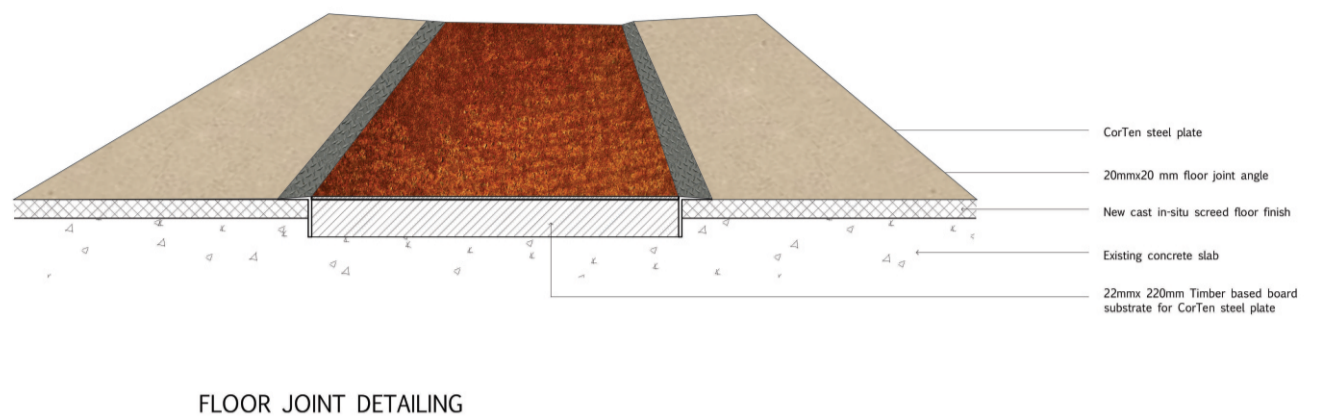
Floor joint detailing, not to scale (Author 2015)
